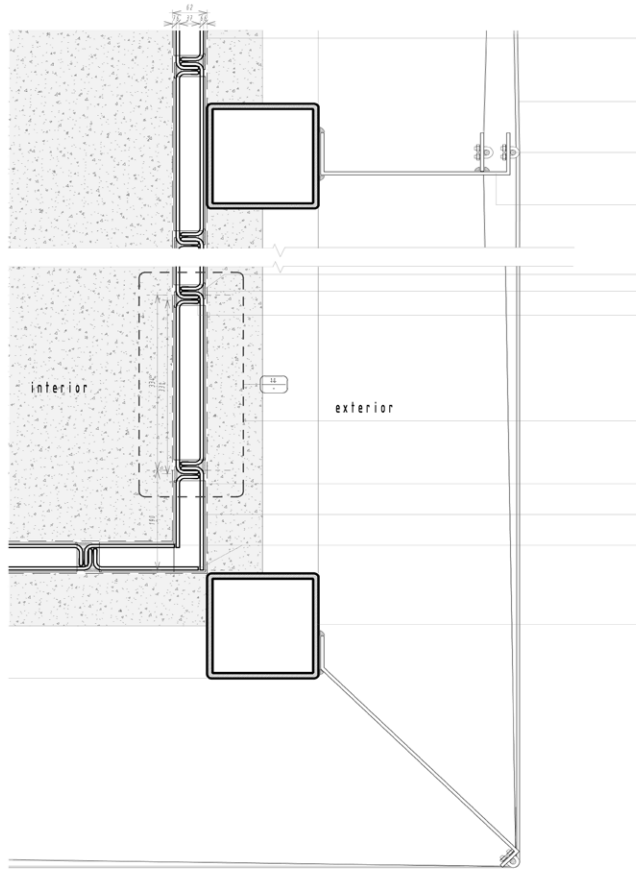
Typical details of the Plkington Profilat u-profile glass system (Author, 2011)
